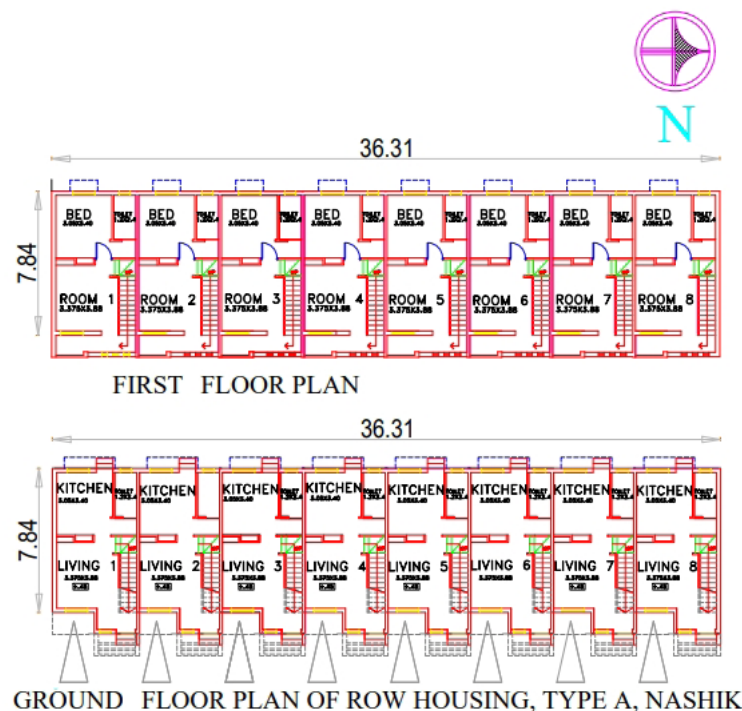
Ground Floor Plan of Row Housing at Nashik, India.
